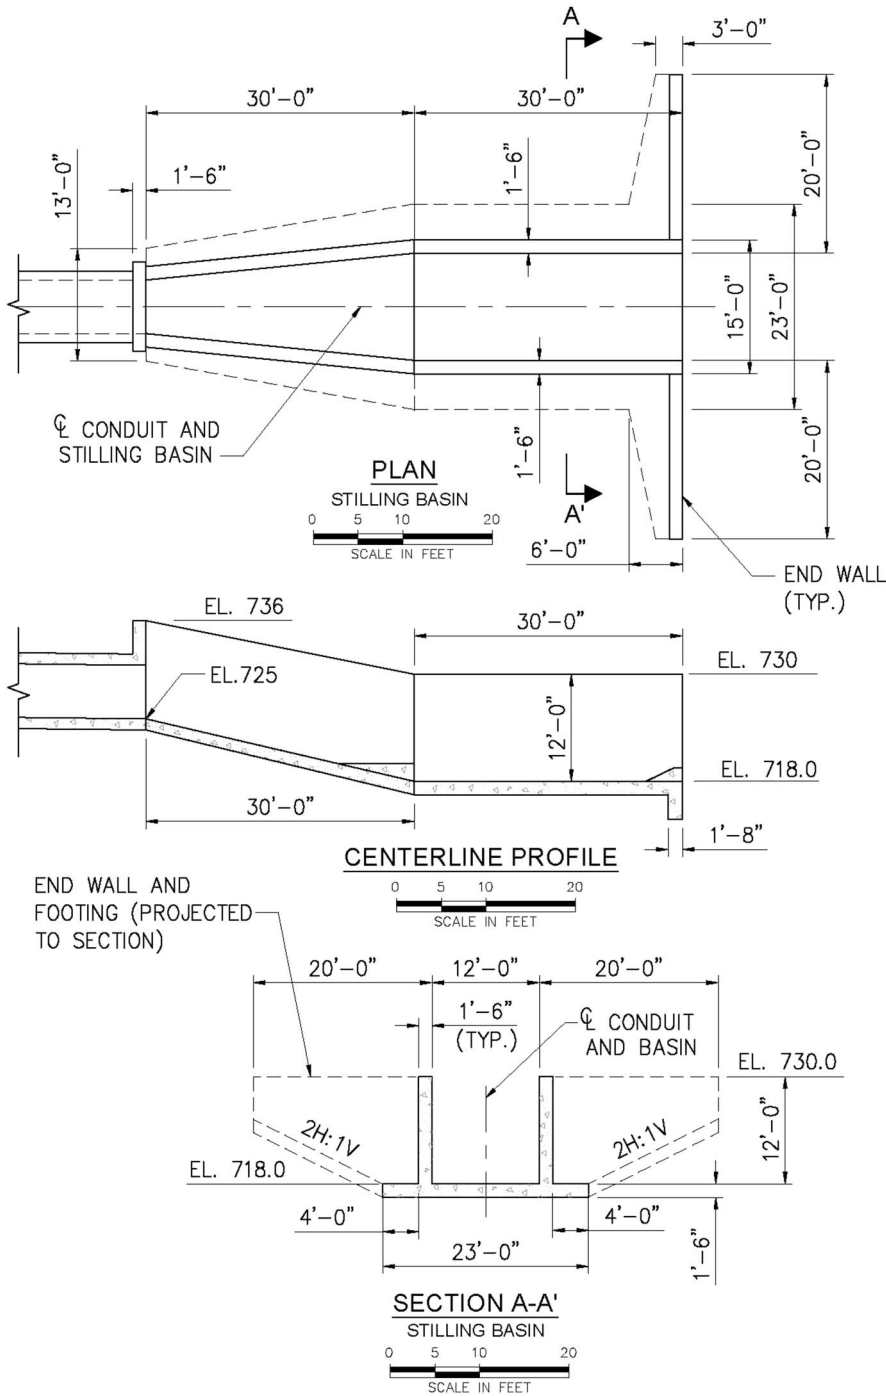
P-2. Plan, Section, and Profile of a Concrete Stilling Basin
